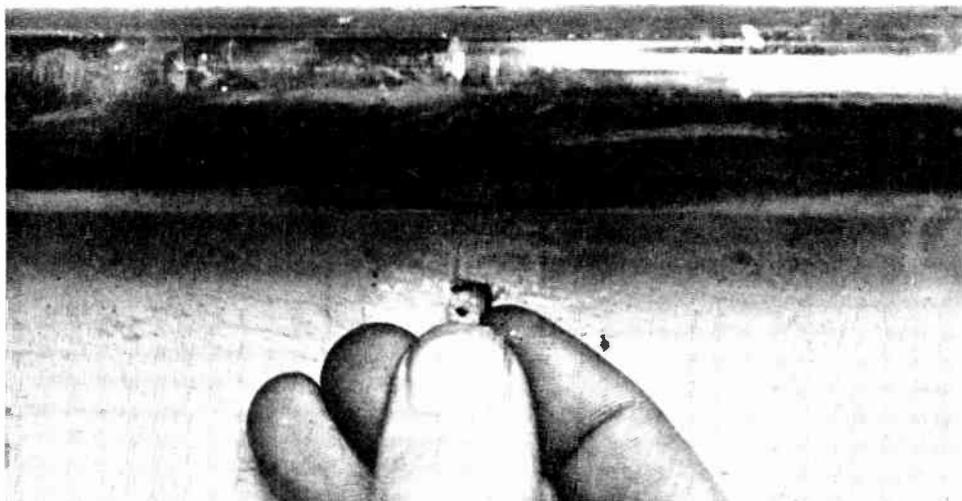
How to Fix Conduit or Tubing to a Wall. THIRD OPERATION.
